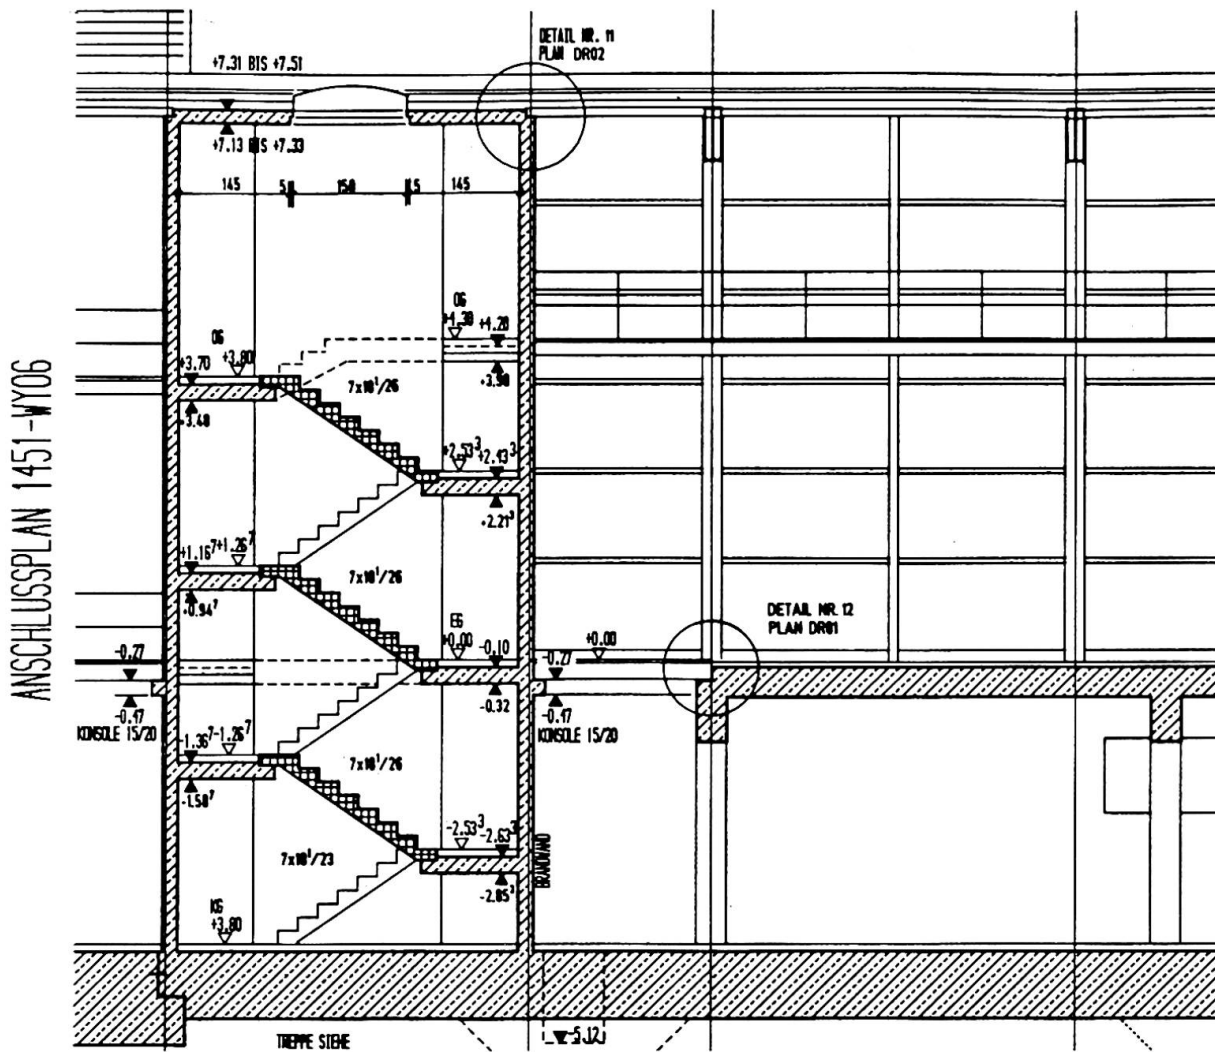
Stairway generated with CAD out of a 3D building model.
